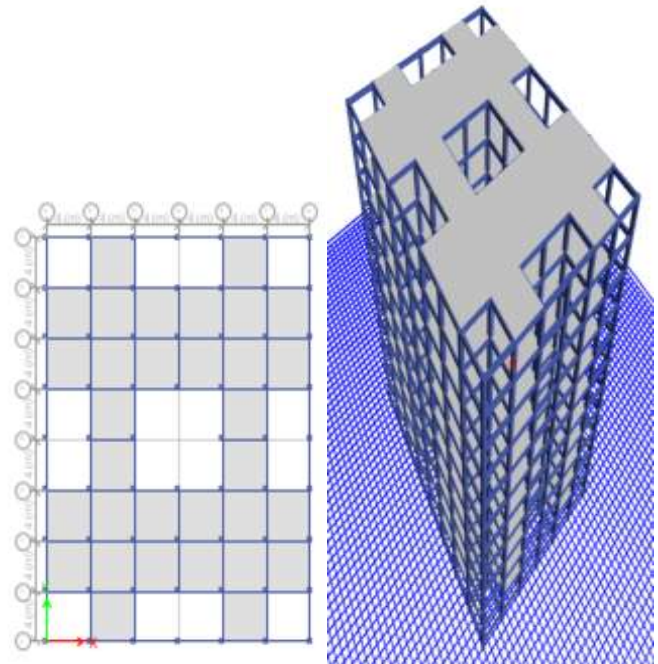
Plan elevation & 3D view for 33.32% slab opening without shear wall.
